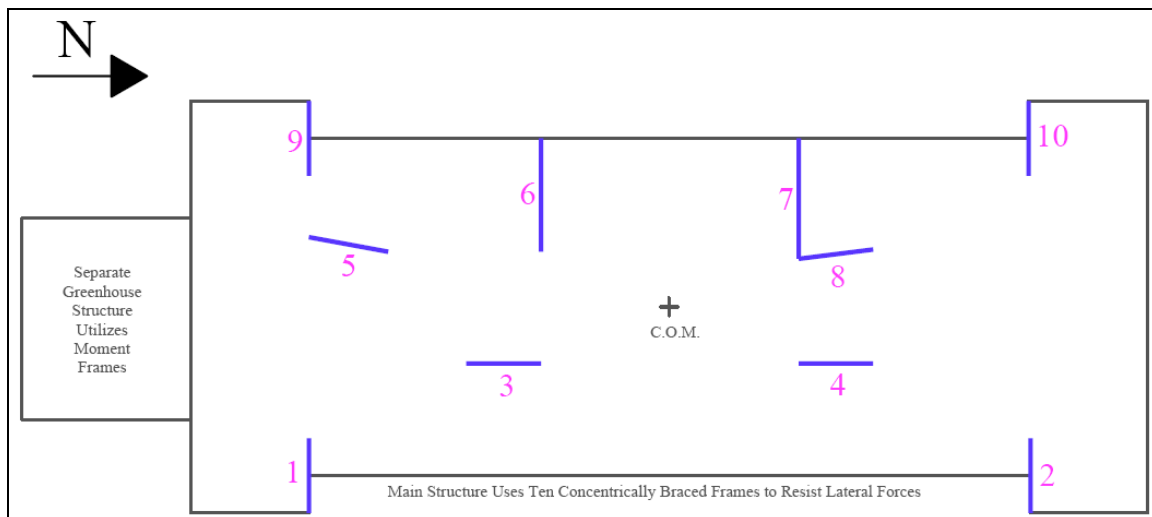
Layout of the 10 Concentrically Braced Frames
